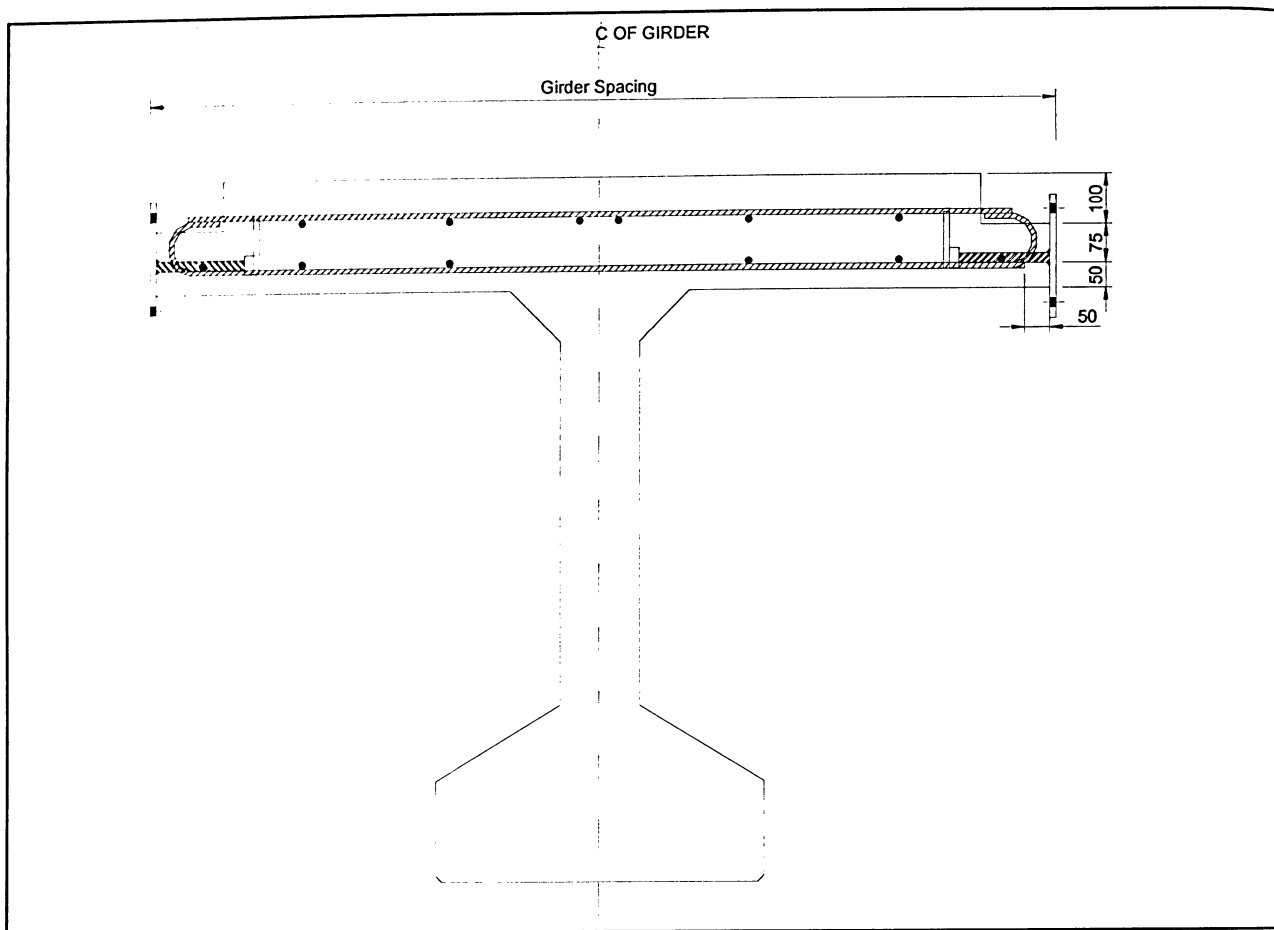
Cross-Section of the IBC-2 Girder Connection with Structural Details
